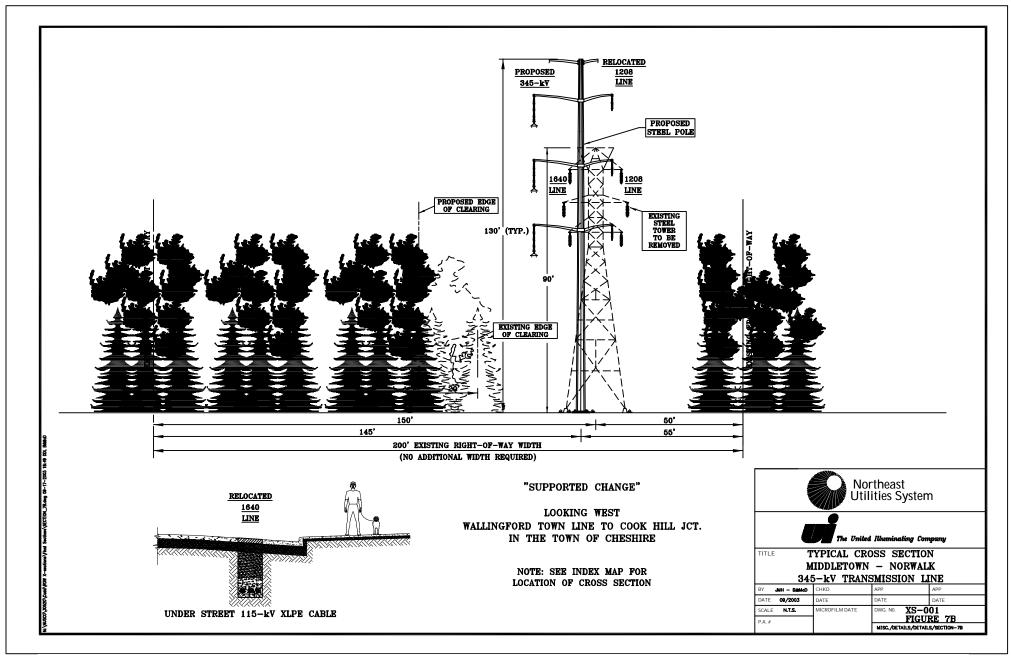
Cross section 7B - Wallingford Town Line to Cook Hill Junction (Cheshire) (Underground 115-kV line located 25 feet to the right (north) of the 345-kV line)
